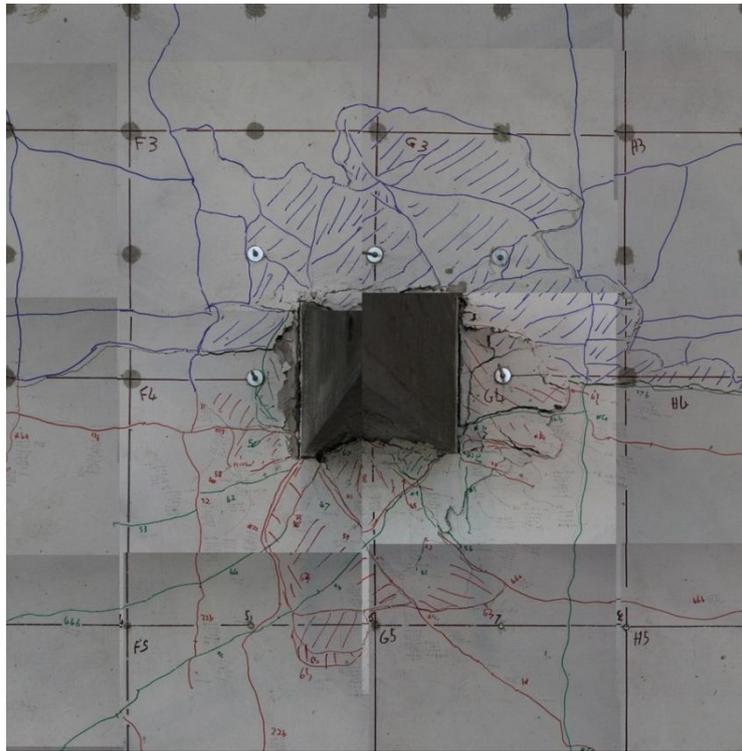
Slab damage in column region after all cycles of test 3.
